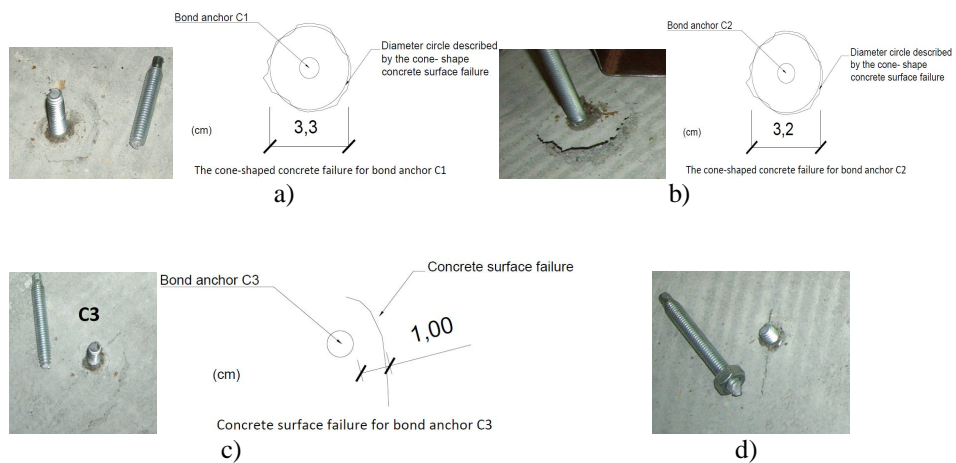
Failure mode of bonded anchors: a) C1; b) C2; c) C3; d) C4 in non-cracked reinforced concrete specimen.
